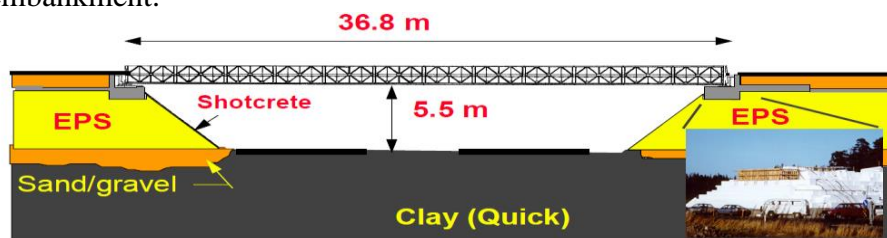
Temporary single-lane steel truss bridge structure supported on EPS block at Lokkeberg, Norway. (Note the absence of deep foundation system at this location.) (after Aabøe and Frydenlund, 2011).
